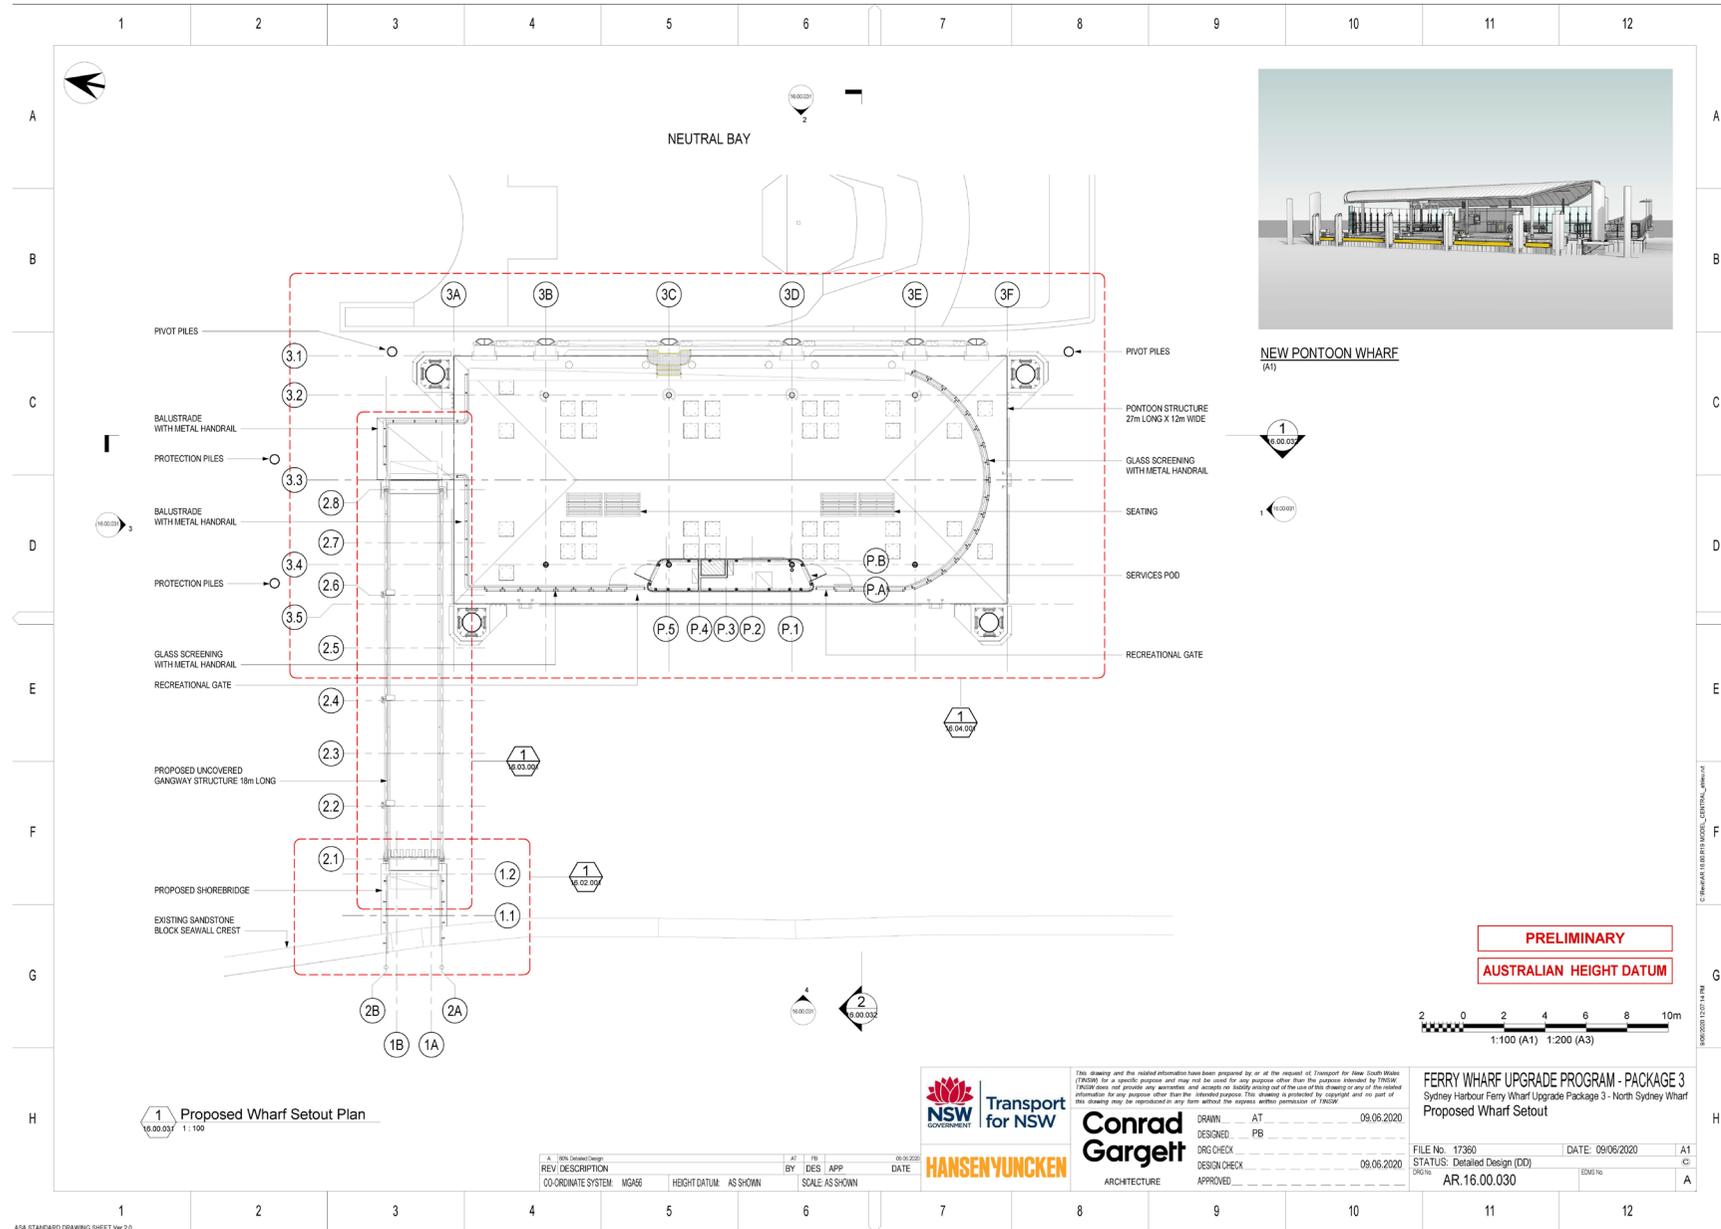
Proposed Wharf Layout (Source: Hansen Yuncken and Conrad Gargett)
